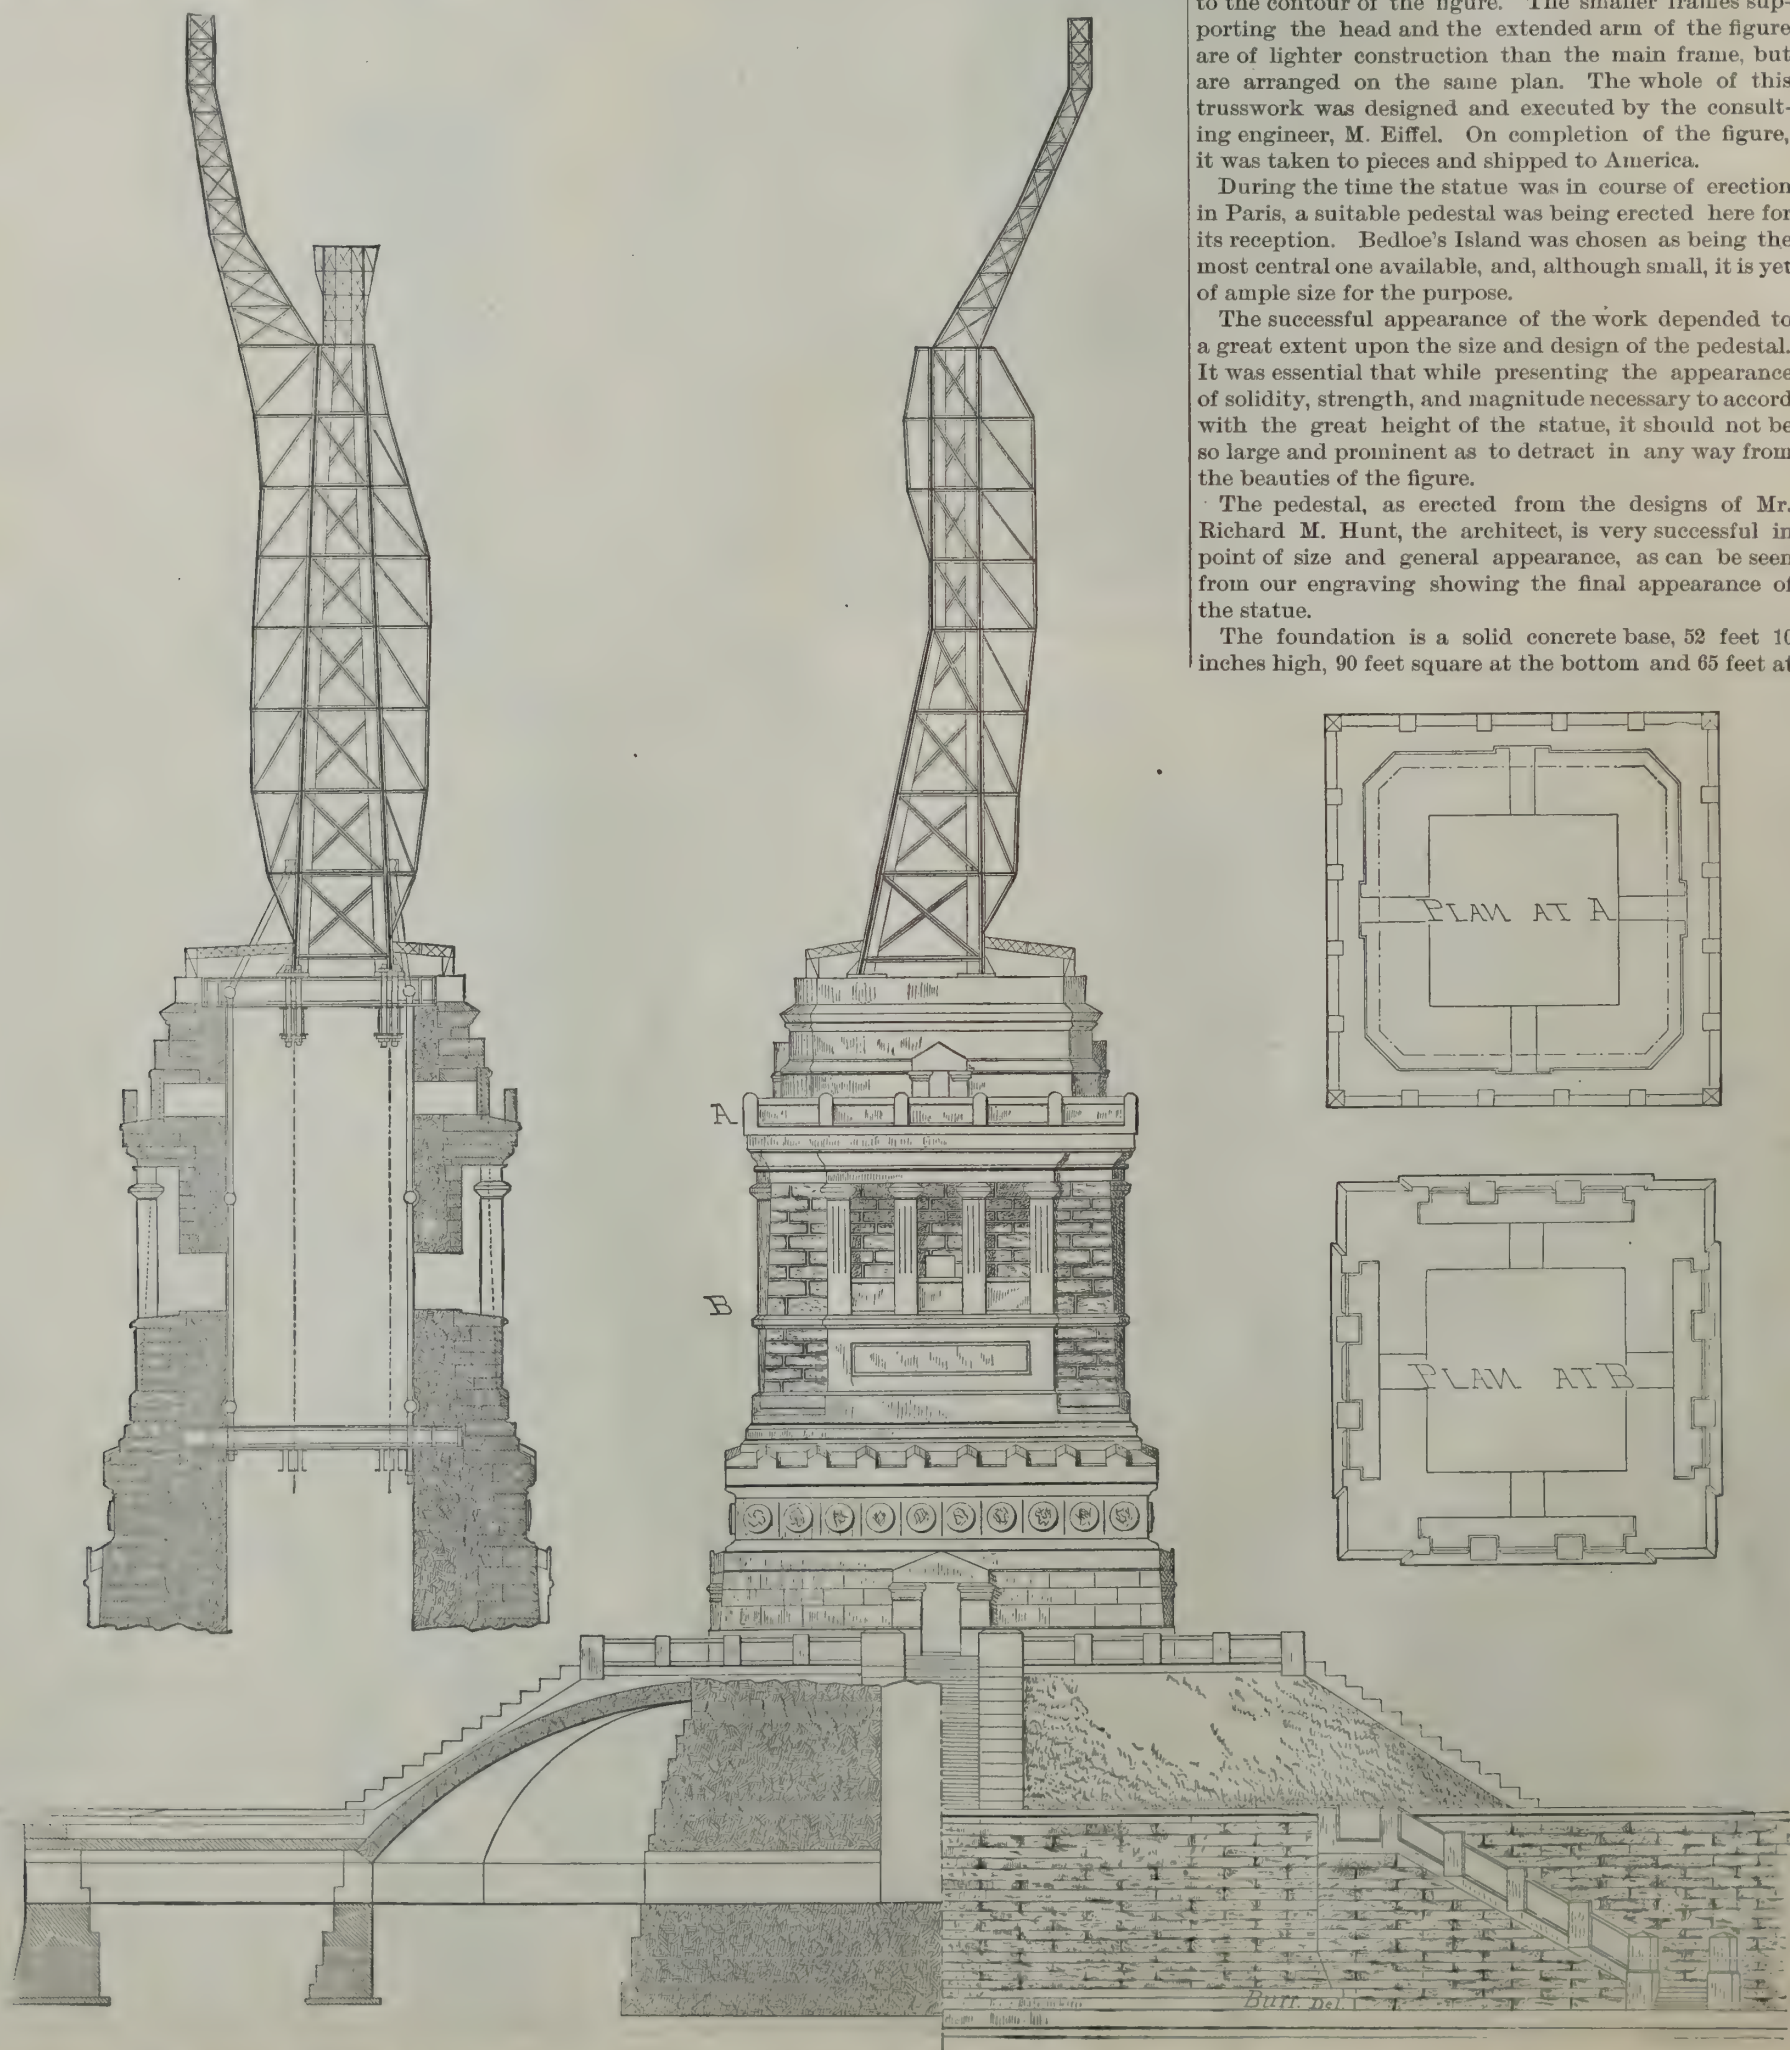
THE STATUE OF LIBERTY.—ELEVATION, PLANS, AND SECTIONS OF PEDESTAL, SHOWING METHOD OF ANCHORING THE STATUE.
